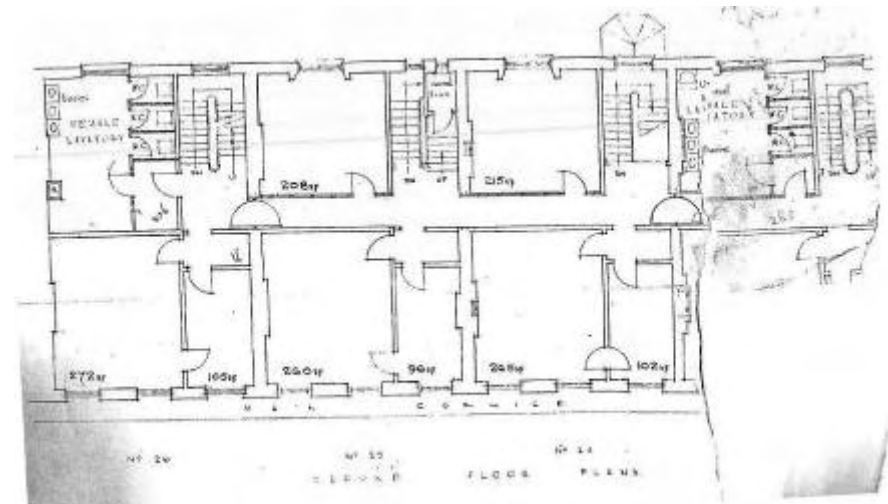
Extract of Ministry of Works plans 1946, Second Floor plan for Chester Terrace Nos. 26 – 24. Crown Estate Archive.
